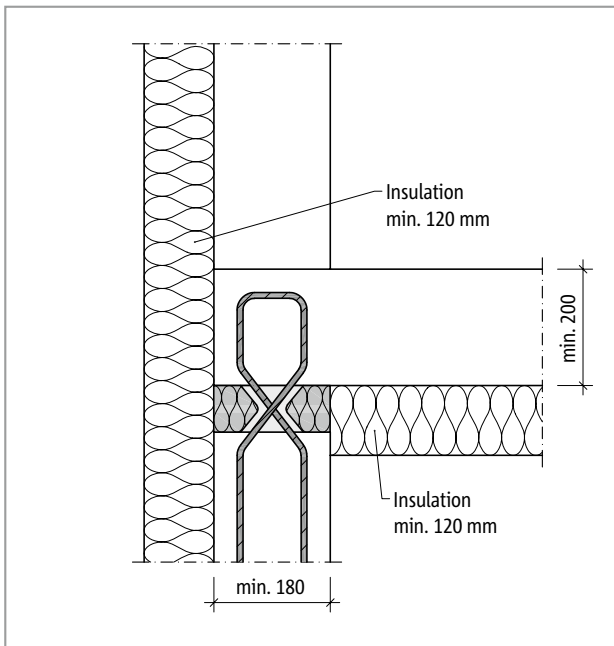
Schöck Sconnex® type W: R 30 / EI 0 with external wall and under-slab insulation, fire load from outside without fire protection measures
